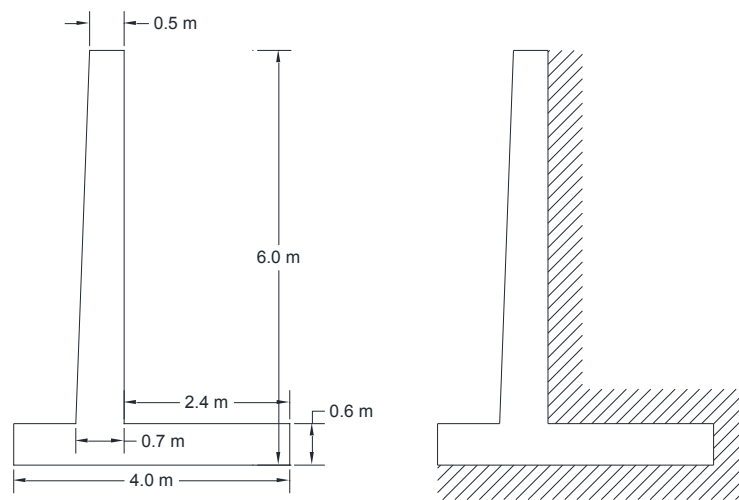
Cantilever retaining wall geometry (Brooks, 2010)
